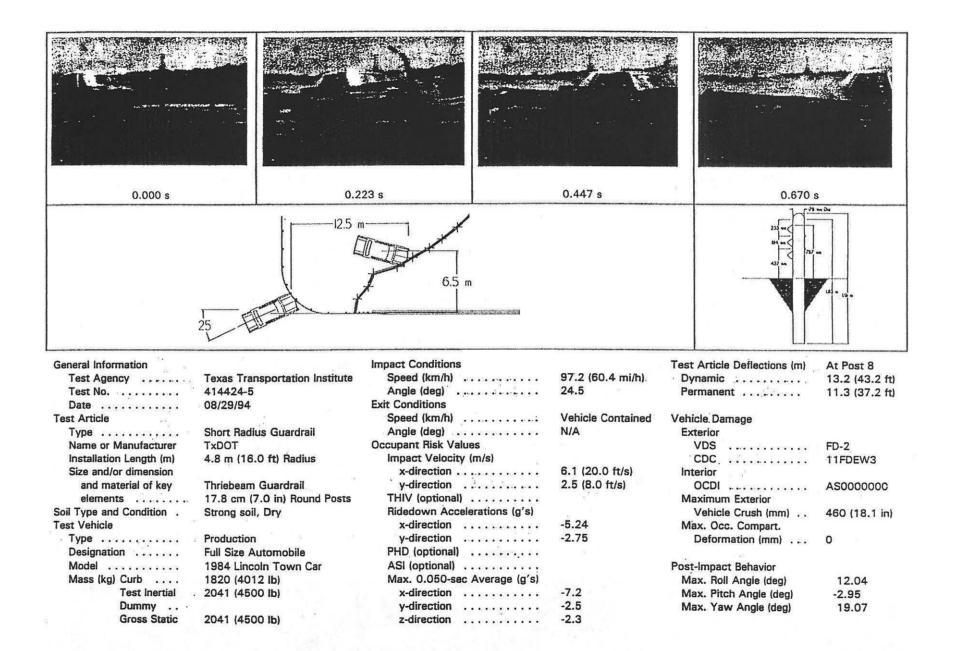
Summary of TTI W-beam Short Radius Guardrail Test 1442-5 (8)
